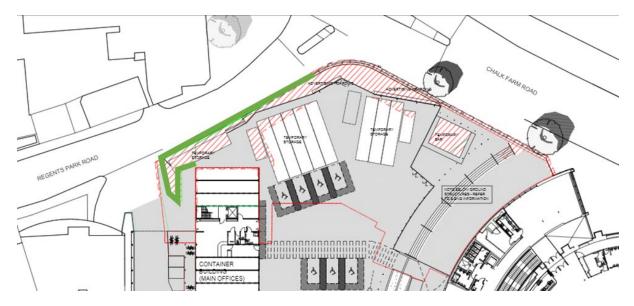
Retailing Wall to be Demolished Marked in Green. Limited pavement closure may be required in this area.
